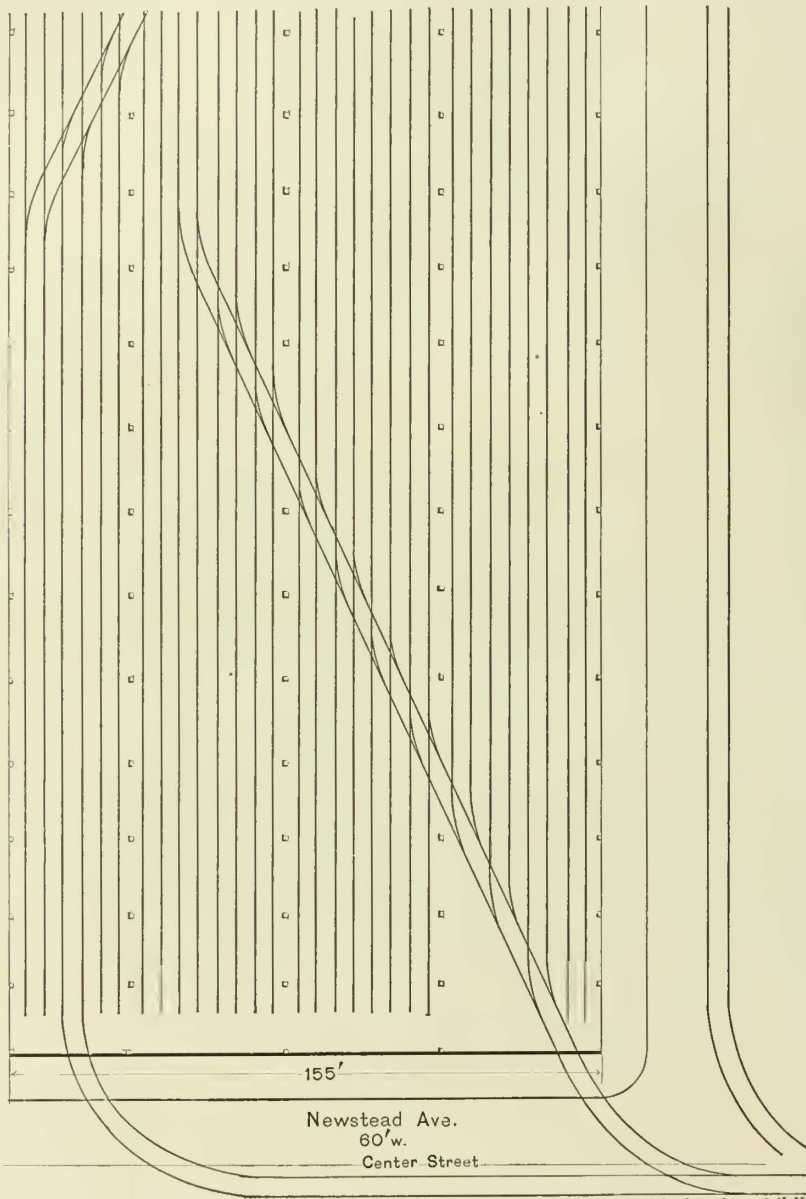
PLAN OF NEW CAR HOUSE—LINDELL RAILWAY CO.
